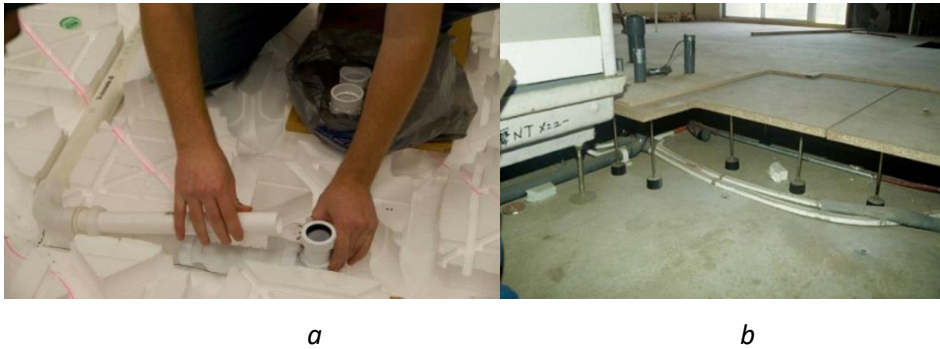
Matrix tile system and raised floor system applications (a: Kendall, 2016 b: Fukao, 2011)
